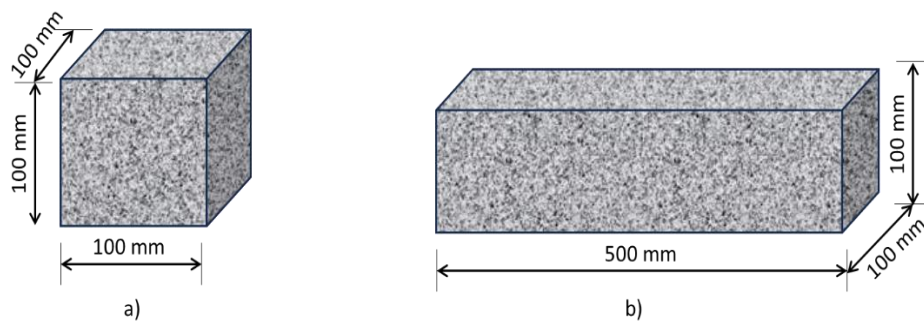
Specimen dimensions for a) the specimen's length, width, and height for compressive strength loading, and b) the specimen's length, width, and height for flexure strength loading.
